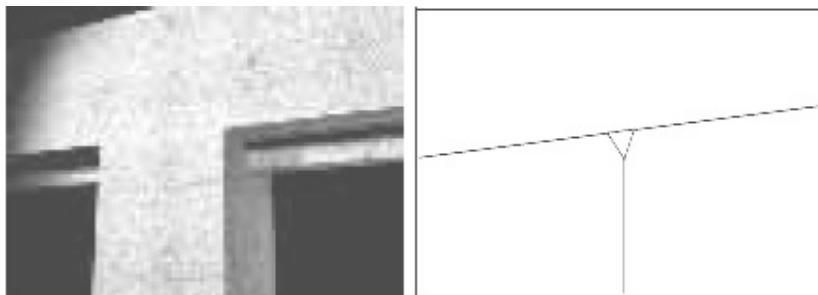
Distinct views on a beam and column in architectural design and structural engineering respectively, after van Leeuwen (1999).
